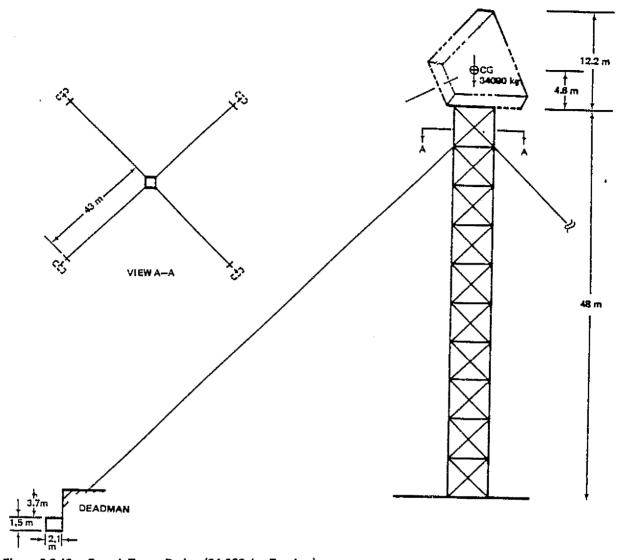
Guyed Tower Design (34,090 kg Receiver)
